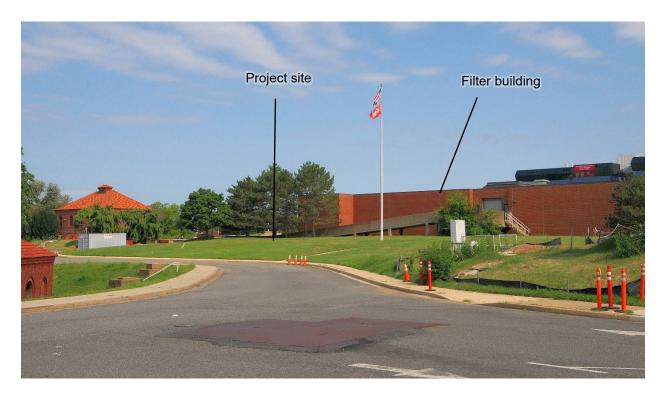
View of the Site Looking Northwest from Adjacent McMillan Drive *The modern filter building is the primary element in this view.
